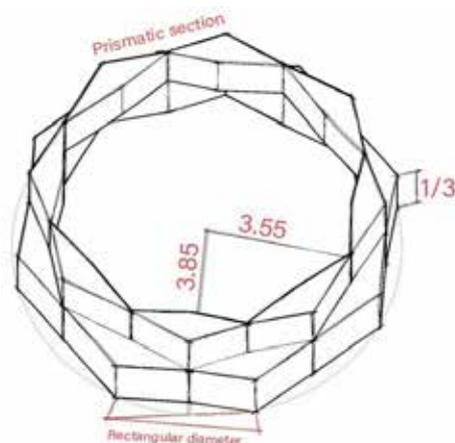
How to place the first and second floors of the Imamzadeh dome. Source: Authors.
